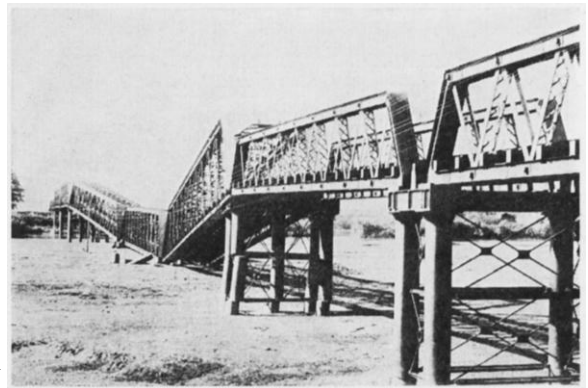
The Nagaragawa bridge after the great Japan earthquake of 1891. Though dropped into the river and given a sinuous course, all spans were still connected and the rails of the approaches indicated compression. (After Milne and Burton.)
